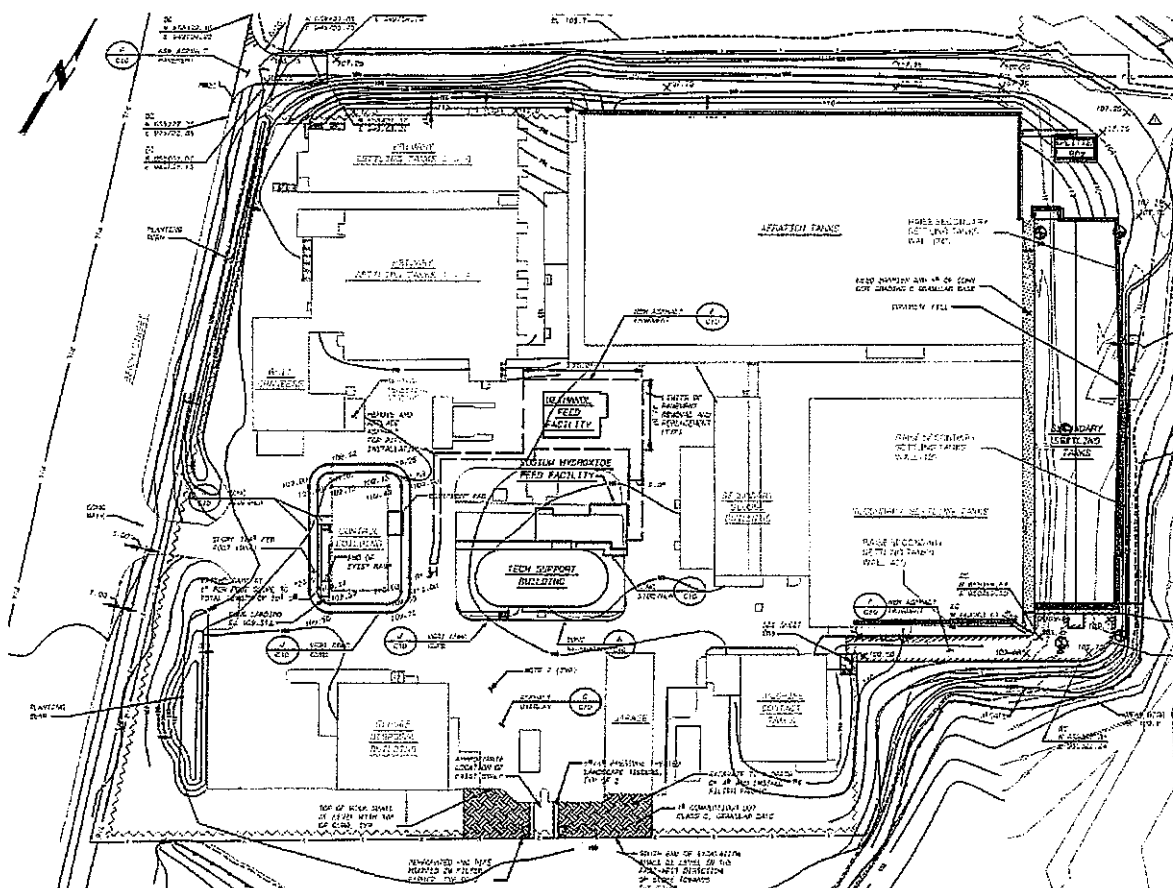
WPCF Selected Alternative - Perimeter Flood Protection Wall
